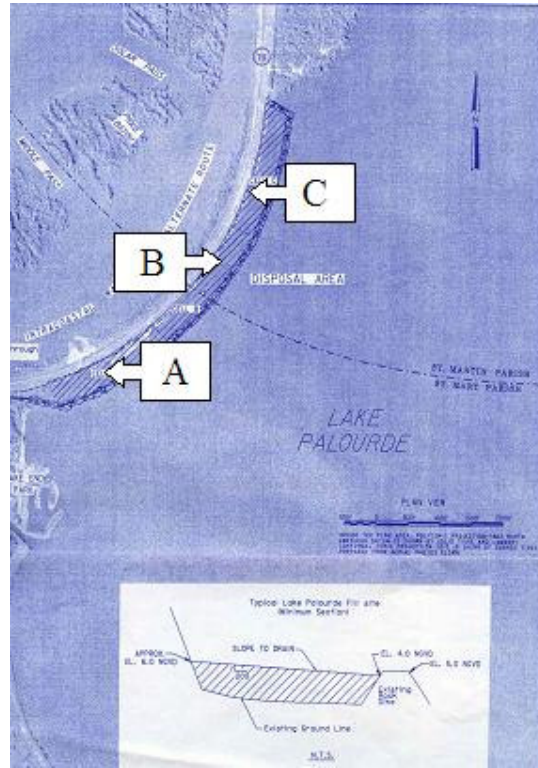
Schematic Plan View of Lake Palourde Fill Site Silt Curtains.
